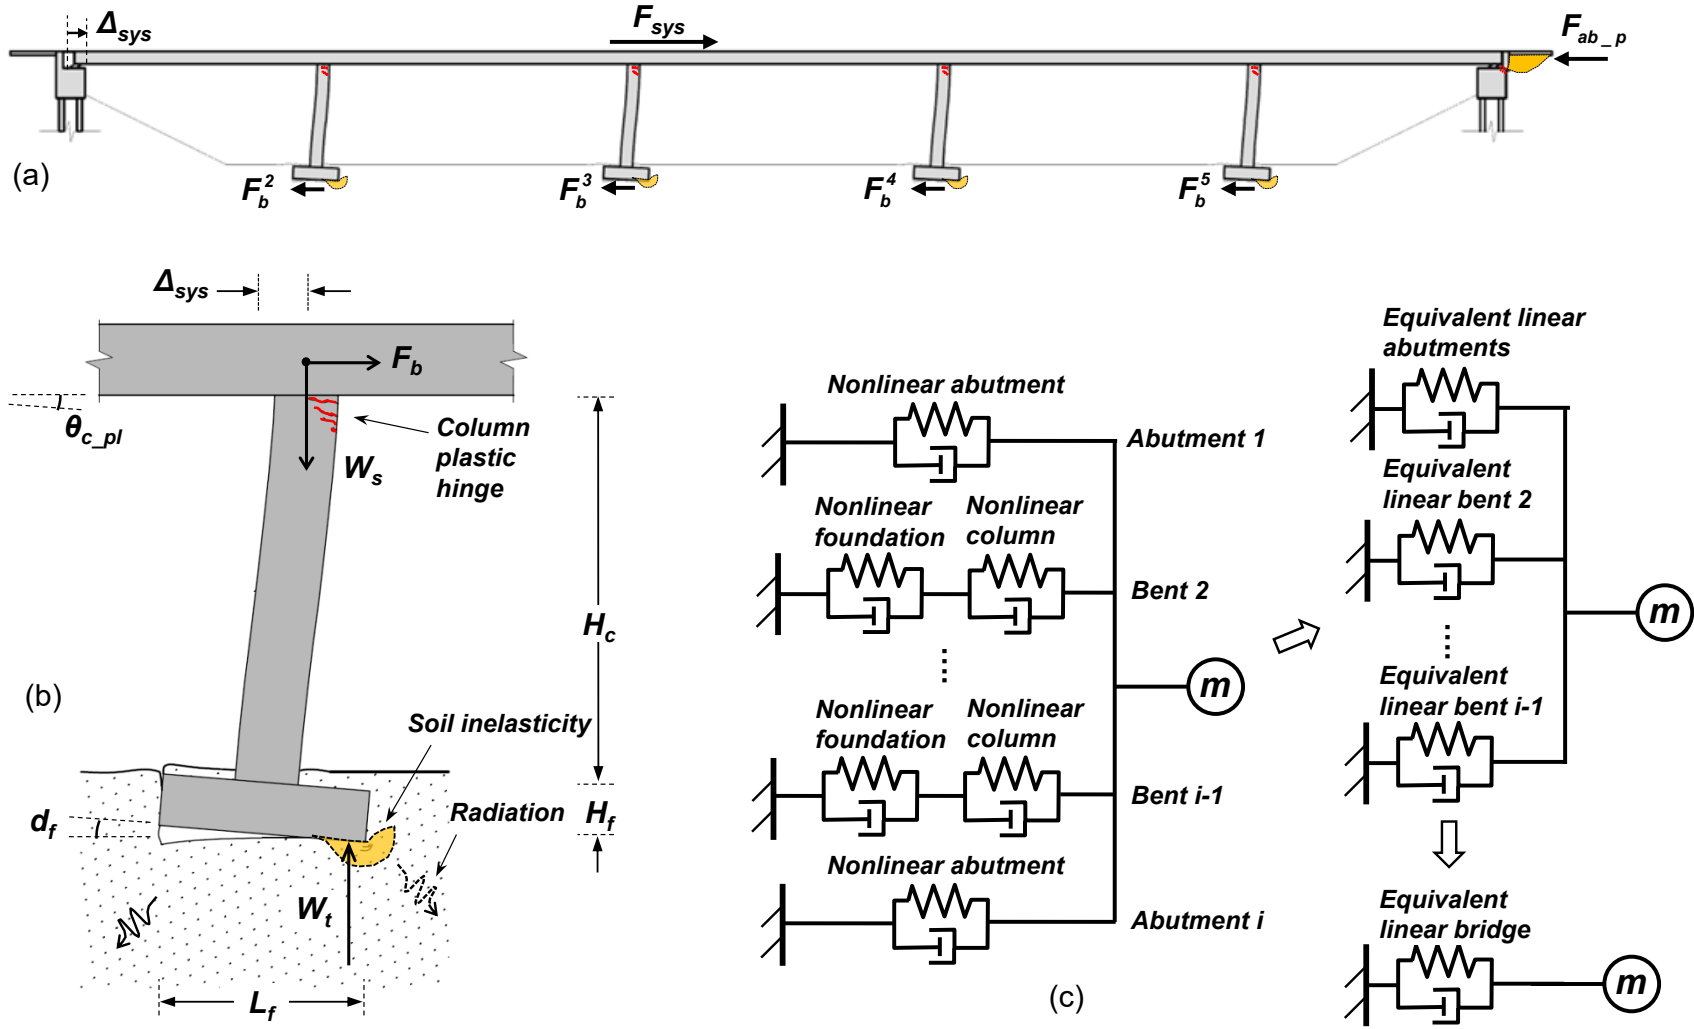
Summary of the displacement-based method for the analysis of a single-column bent bridge in the longitudinal direction with columns on rocking shallow foundations and plastic hinging at their top: (a) Elevation view of the bridge at deformed state; (b) elevation view of a bent at deformed state; (c) representation of the bridge response coupling in parallel pairs of viscoelastic elements that represent bents and abutments and integration to a single viscoelastic element.
